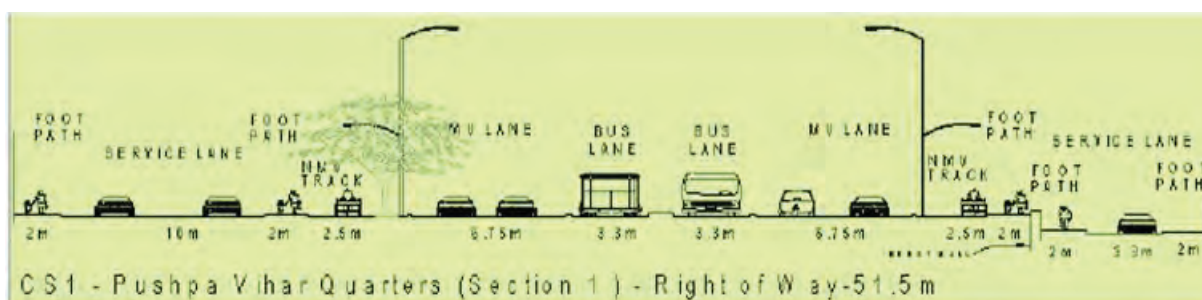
Cross section of arterial road after implementation of Delhi BRT project
